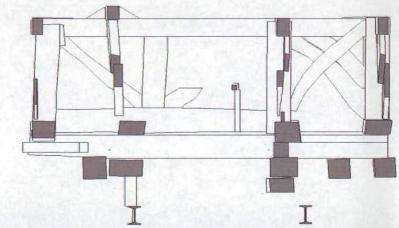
View of bellframe as existing showing arrangement of bells and position of timber foundation beams and inserted steel beams (drawing by Bill Blake/Andy Crispe)
